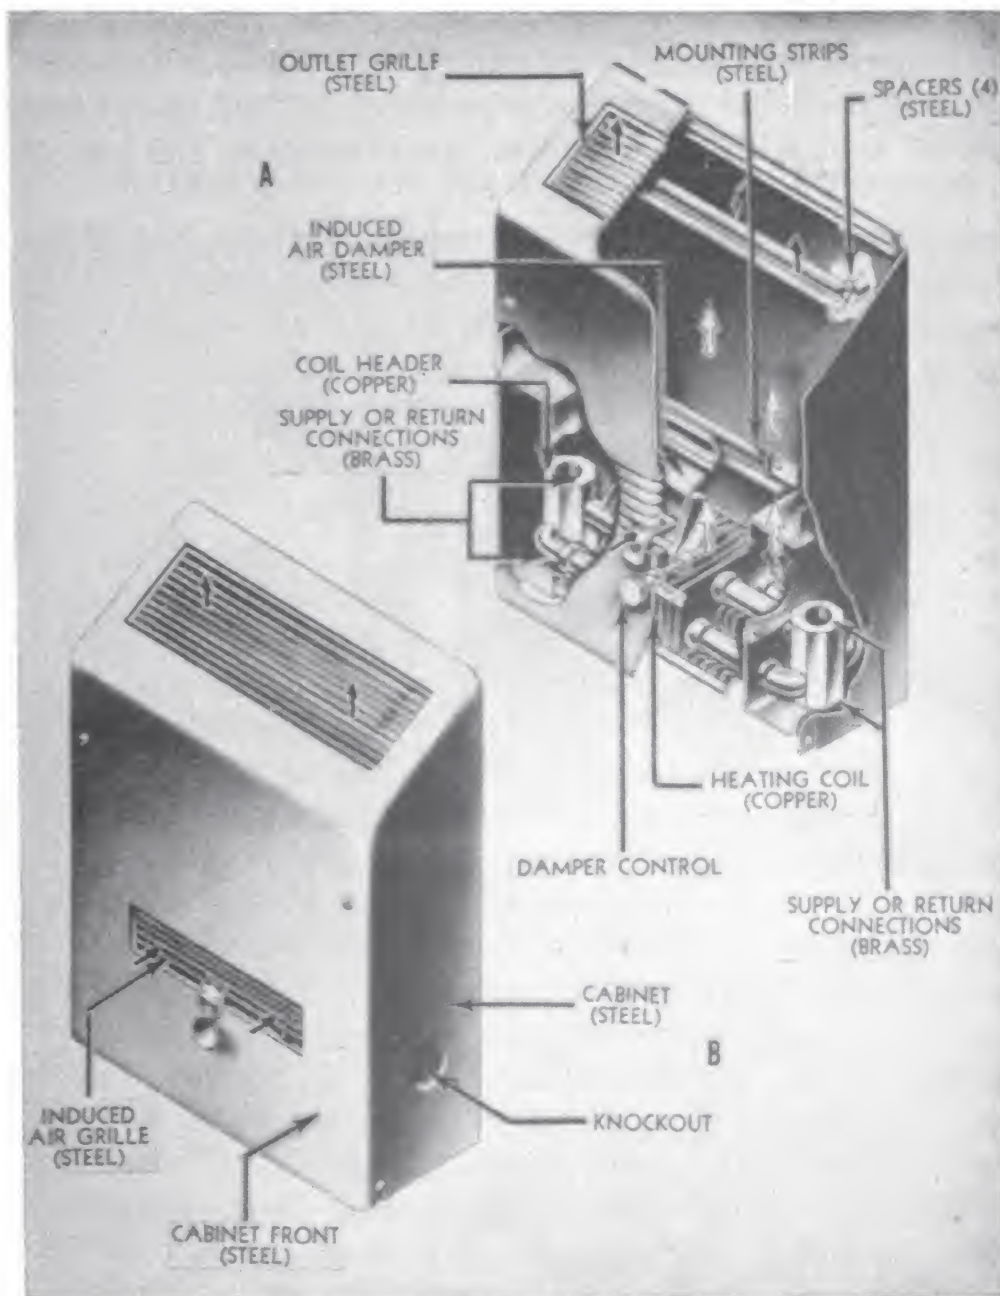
Convactor heater: (A) cutaway view; (B) exterior view.
